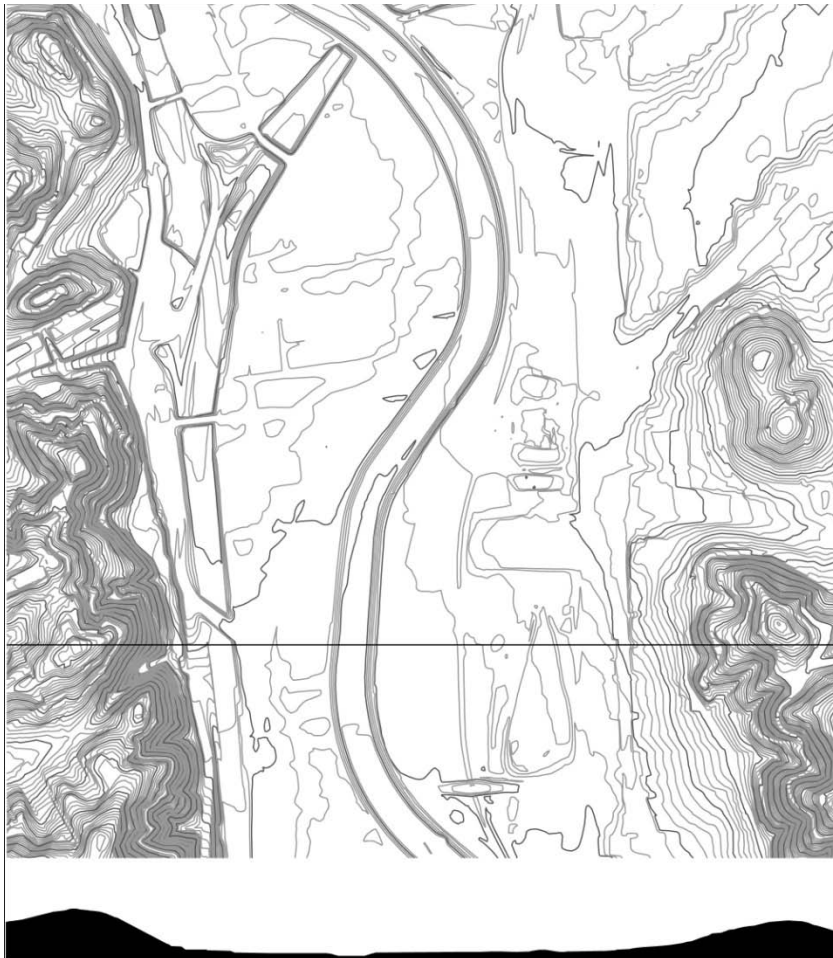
Existing topography and cross section (looking downstream) at Taylor Yard
